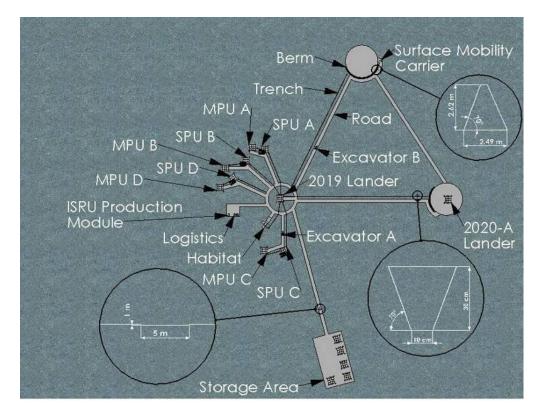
Example of a Notional Lunar Base Site Plan (Mueller et al, 2008)
